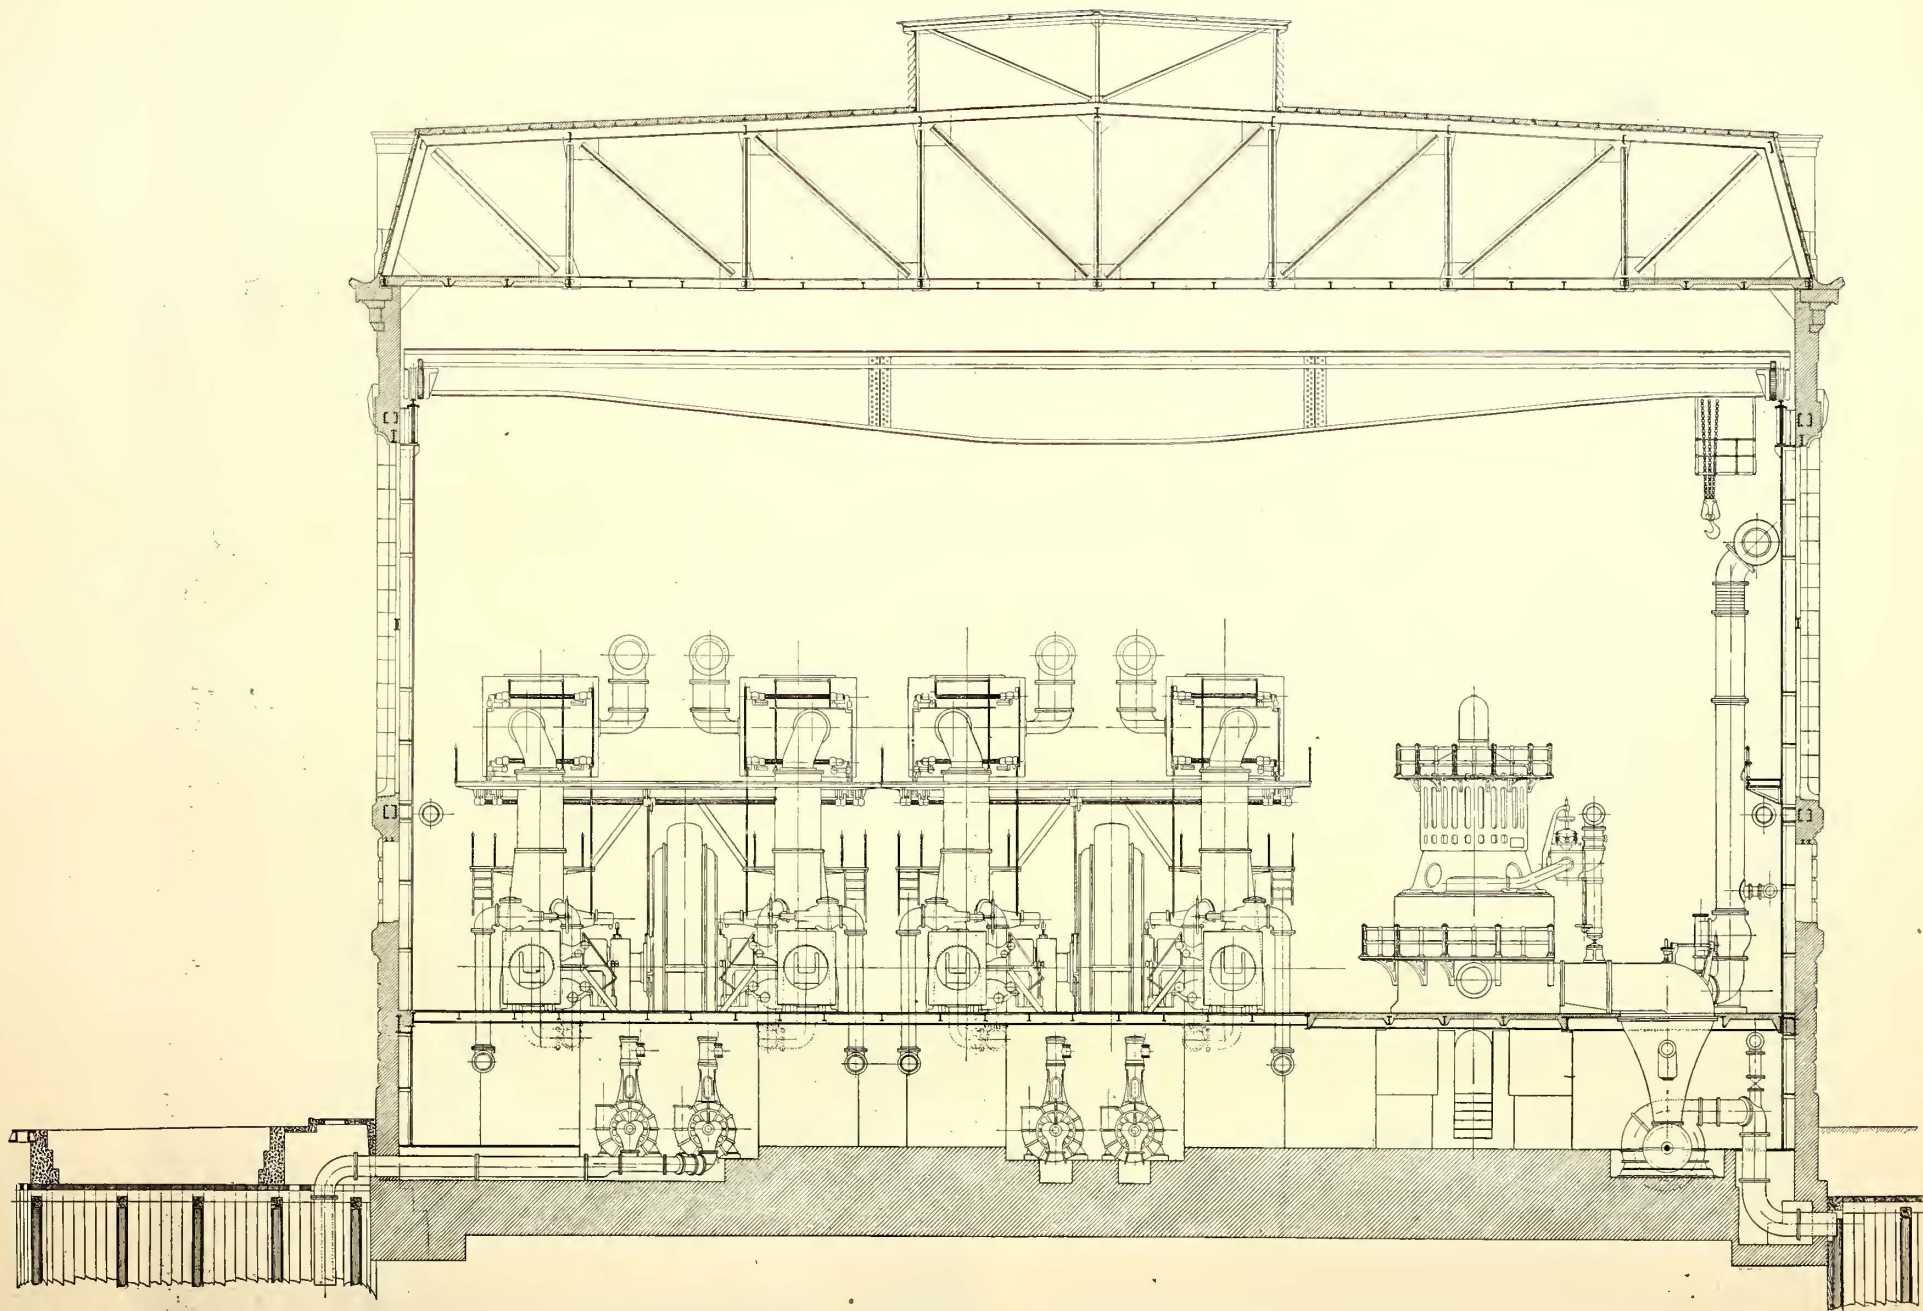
CROSS SECTION OF NO. 1 OPERATING ROOM, LOOKING NORTH, PRATT STREET POWER HOUSE
